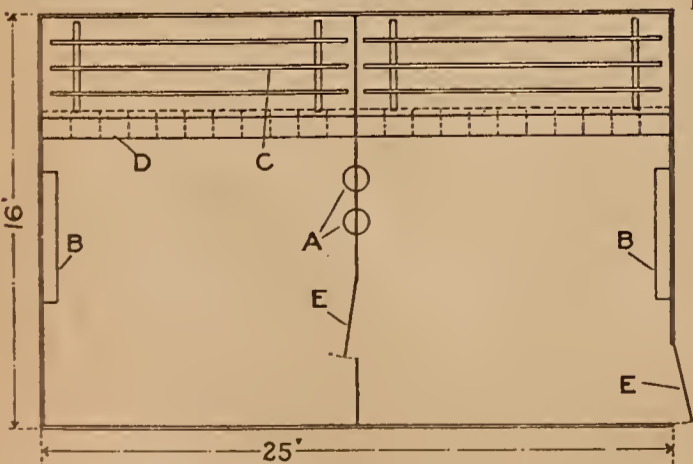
Floor plan: A, water-fountains; B, dry-mash hoppers; C, roosts; D, nests; E, doors
